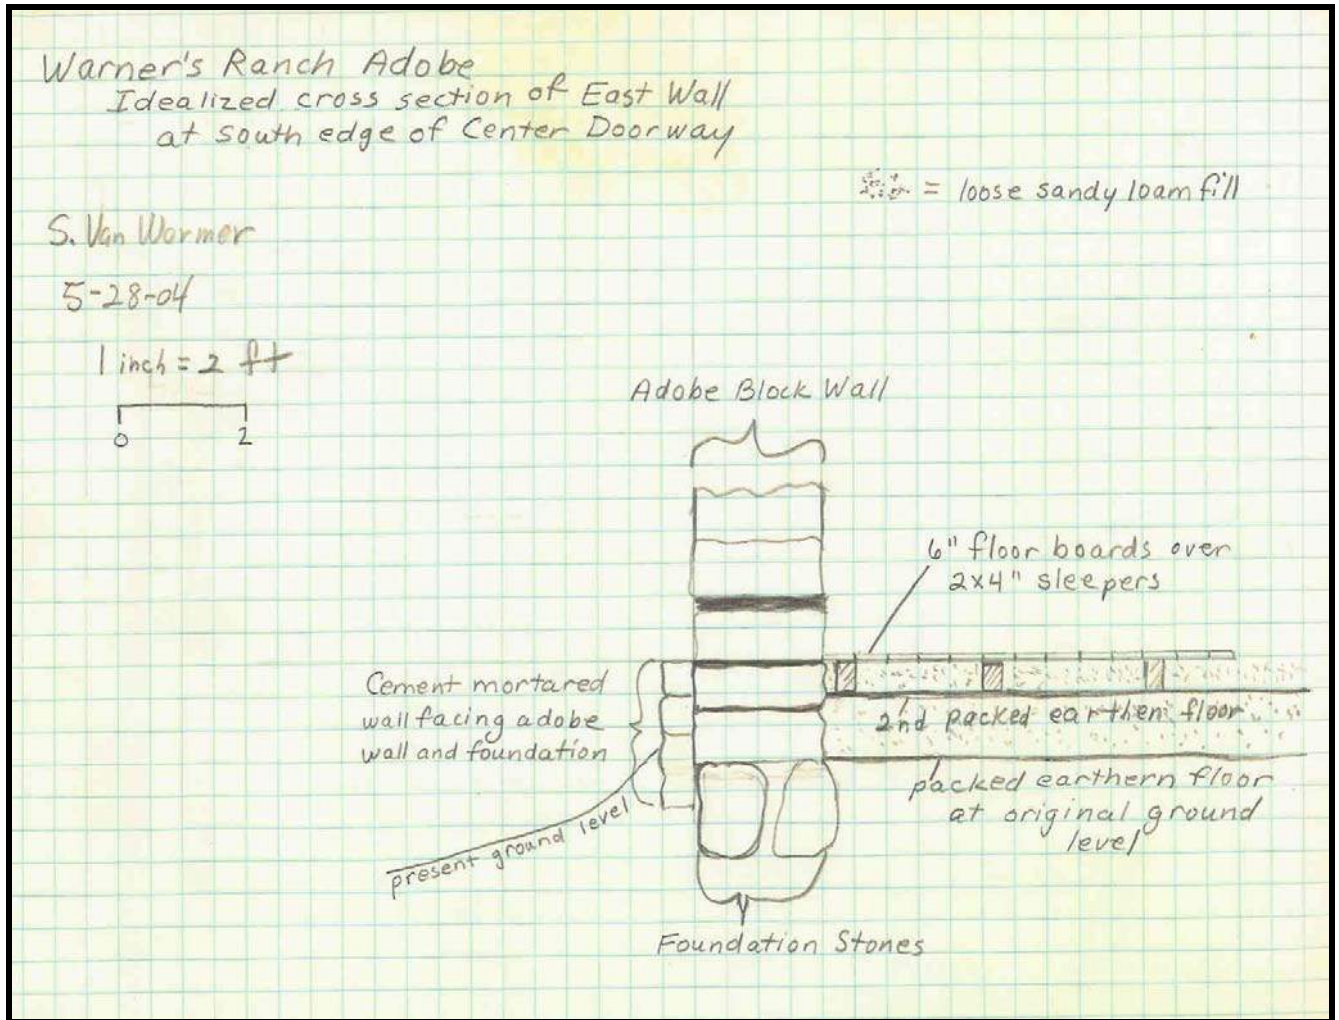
Idealized cross section of the base of the east wall of the Ranch House at the south edge of the center doorway, showing how the cement facing covers both bottom course of adobe block and the upper part of the original granite field stone foundation. The various levels of the packed earthen floors encountered while excavating the interior of the Entry Room (101), as well as the current wooden floor are shown.
